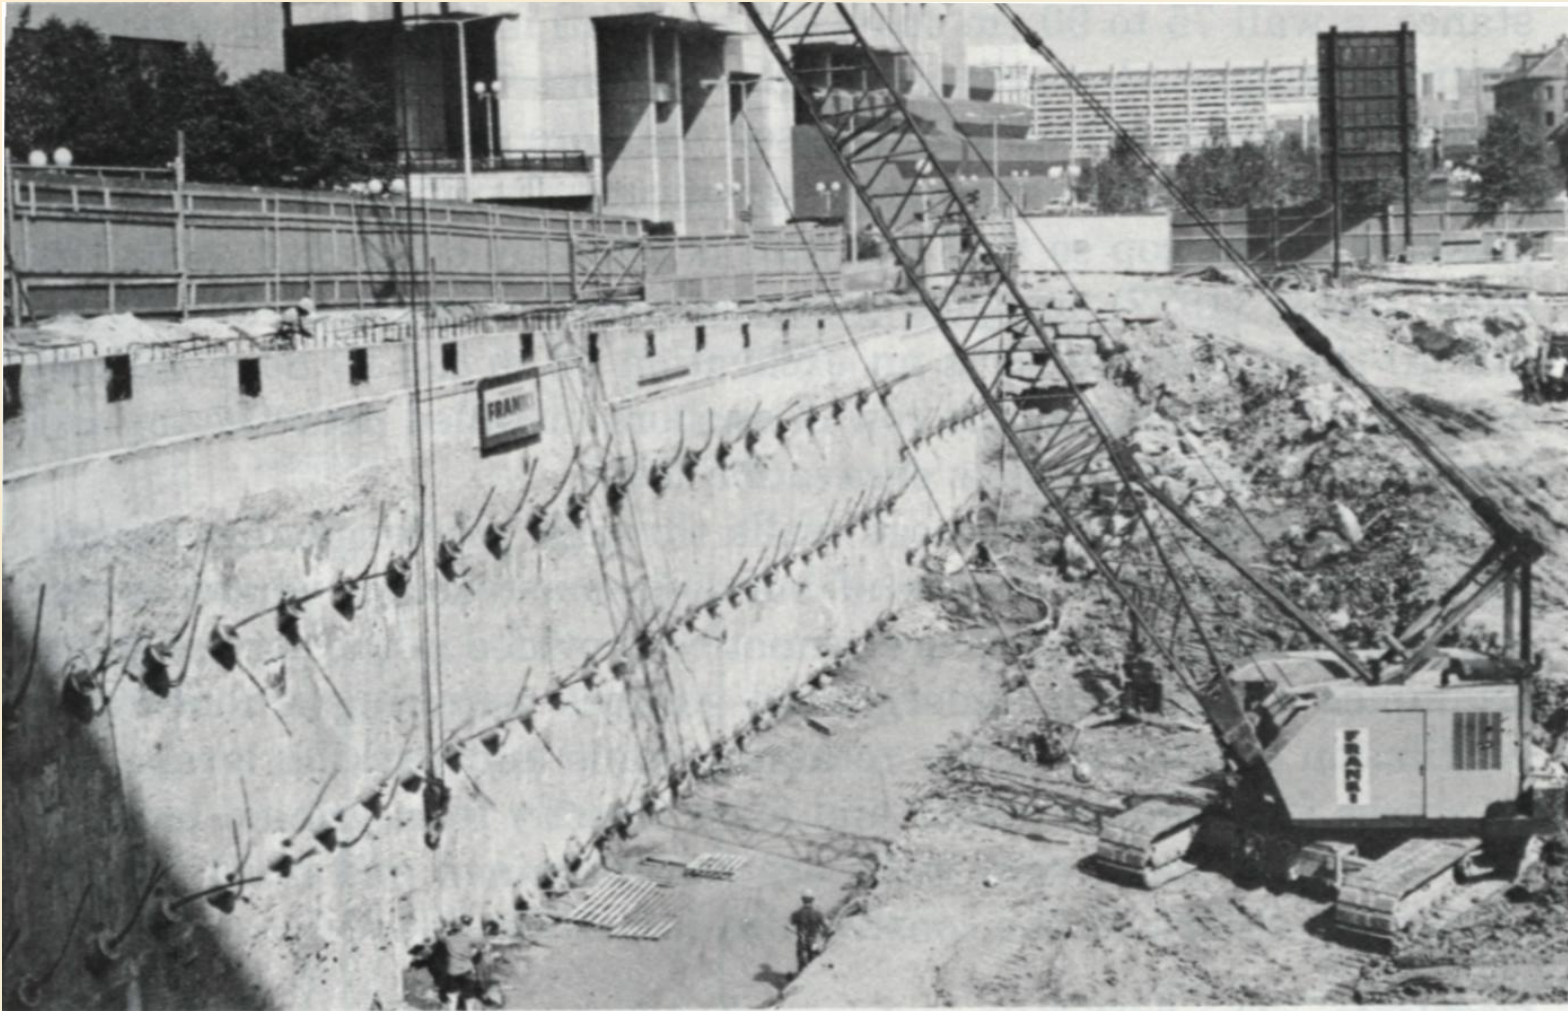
Diaphragm walls for the Sixty State Street Tower, Boston. (*Franki.*)
